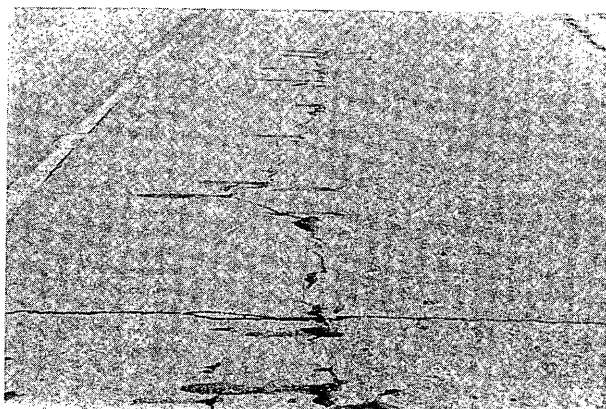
Typical longitudinal transverse cracking in SEA section of Test Road 1 (Kuwait diversion).
